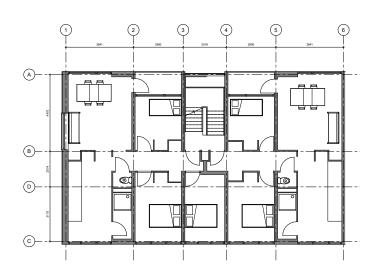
Bouwen Erwoutszstraat typical floor plan of block unit .
